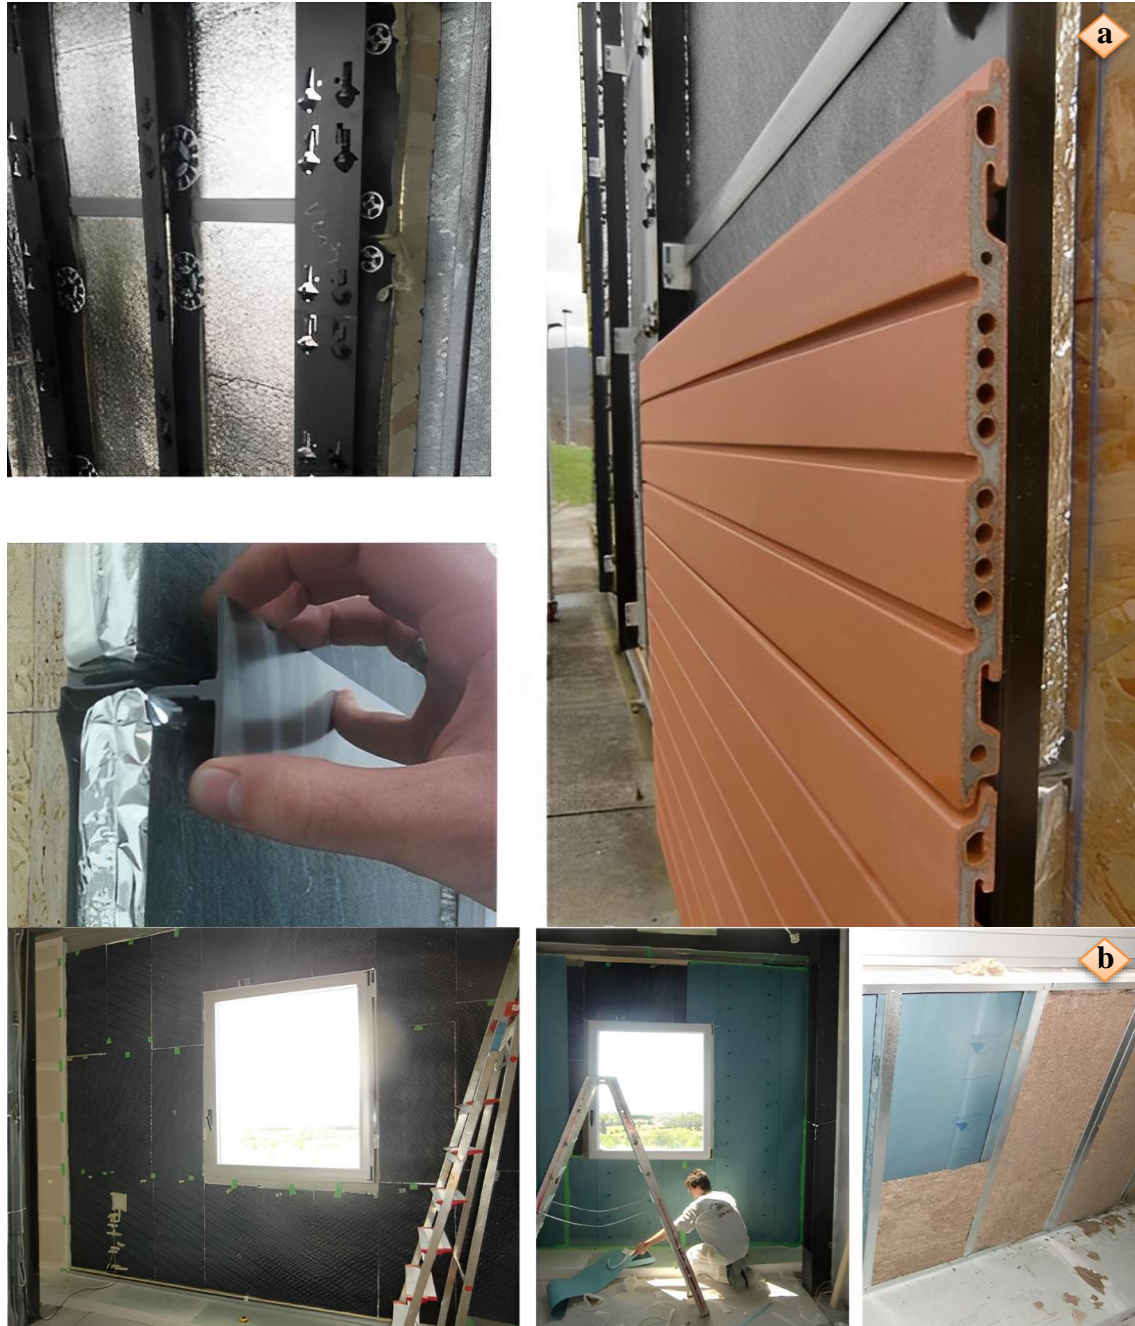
a) Ventilated facade design with VIP-based external wall insulation, and b) standard stud-mounted internal wall insulation of VIPs [25].
